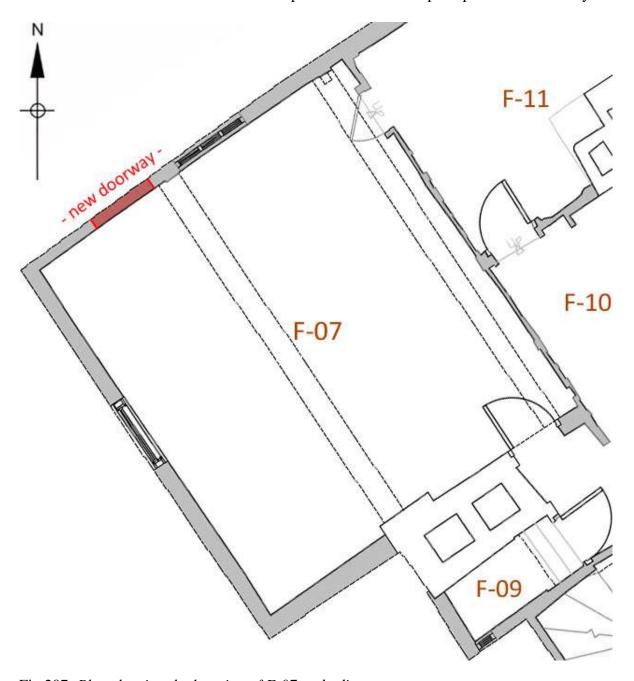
Plan showing the location of F-07 and adjacent rooms
